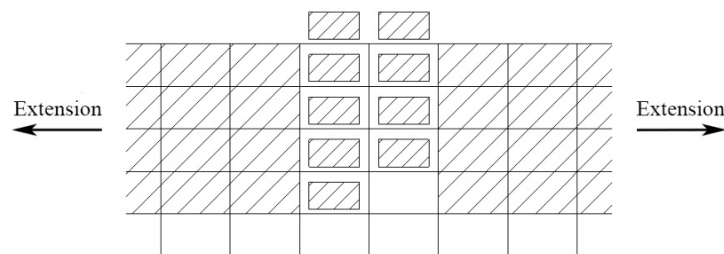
Hazard model of load distribution on steel storage racks without bracings.
